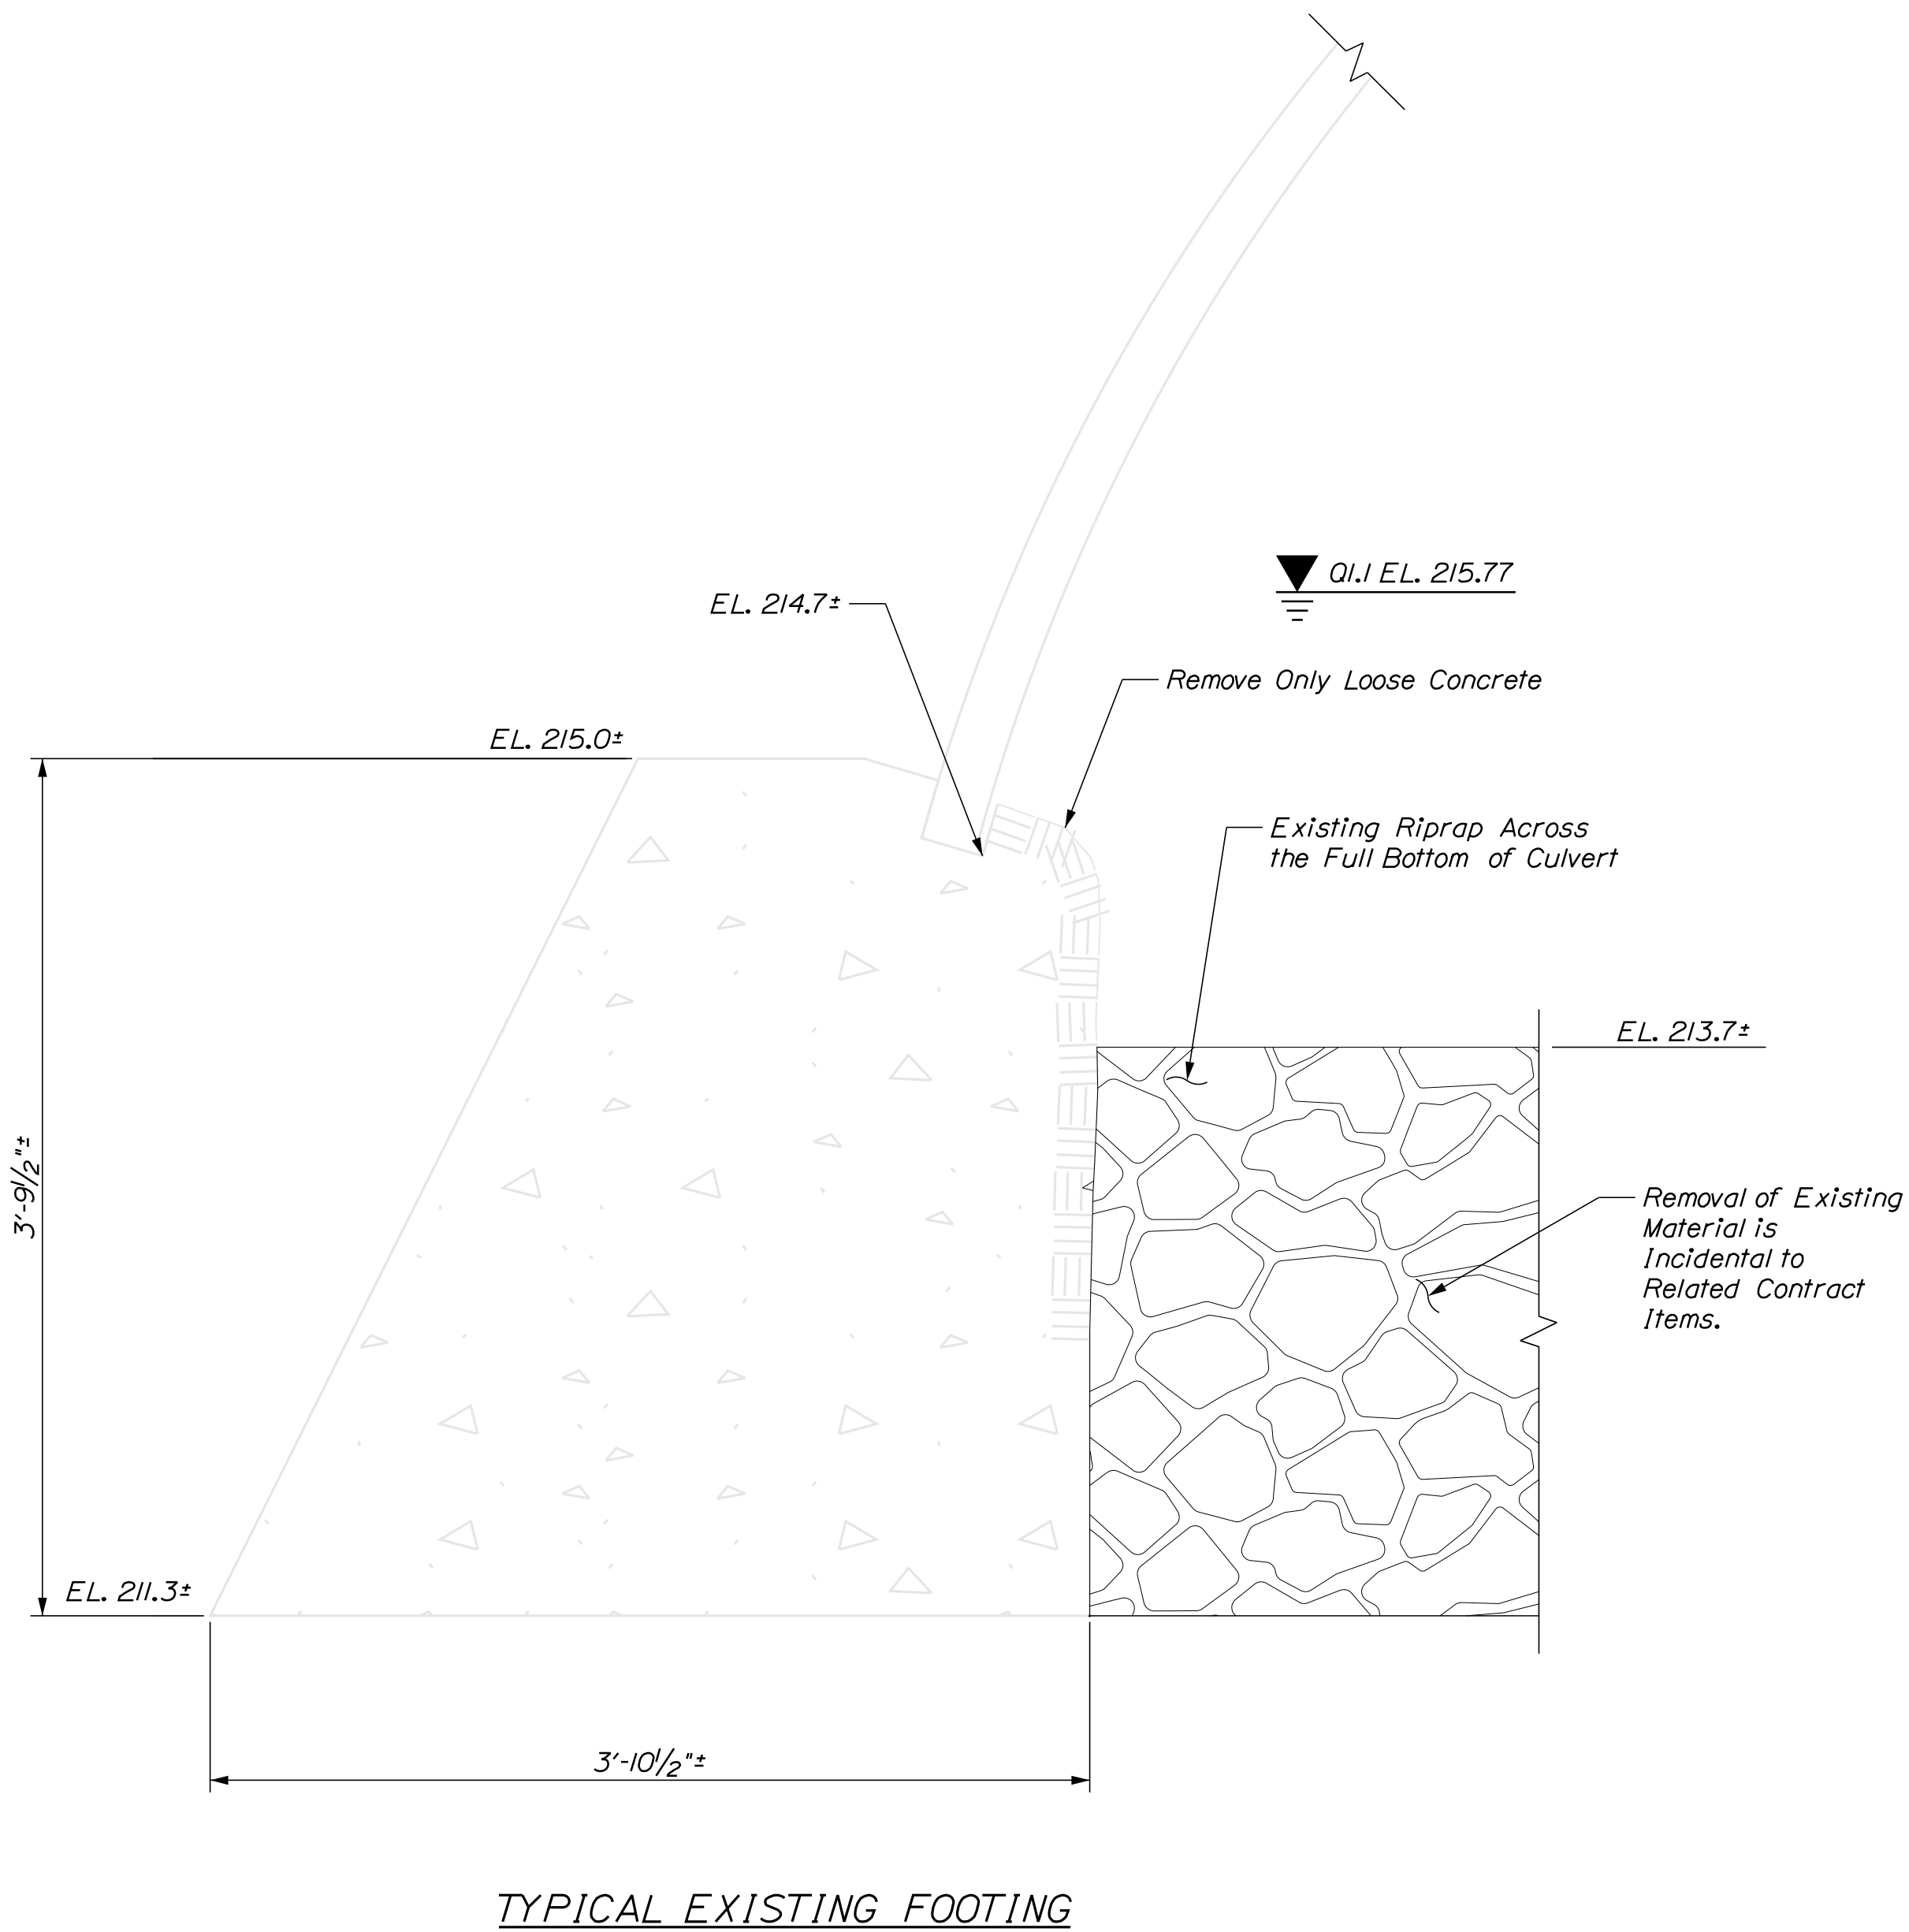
PLATE ARCH FOOTING ELEVATION LONGITUDINAL SECTION
